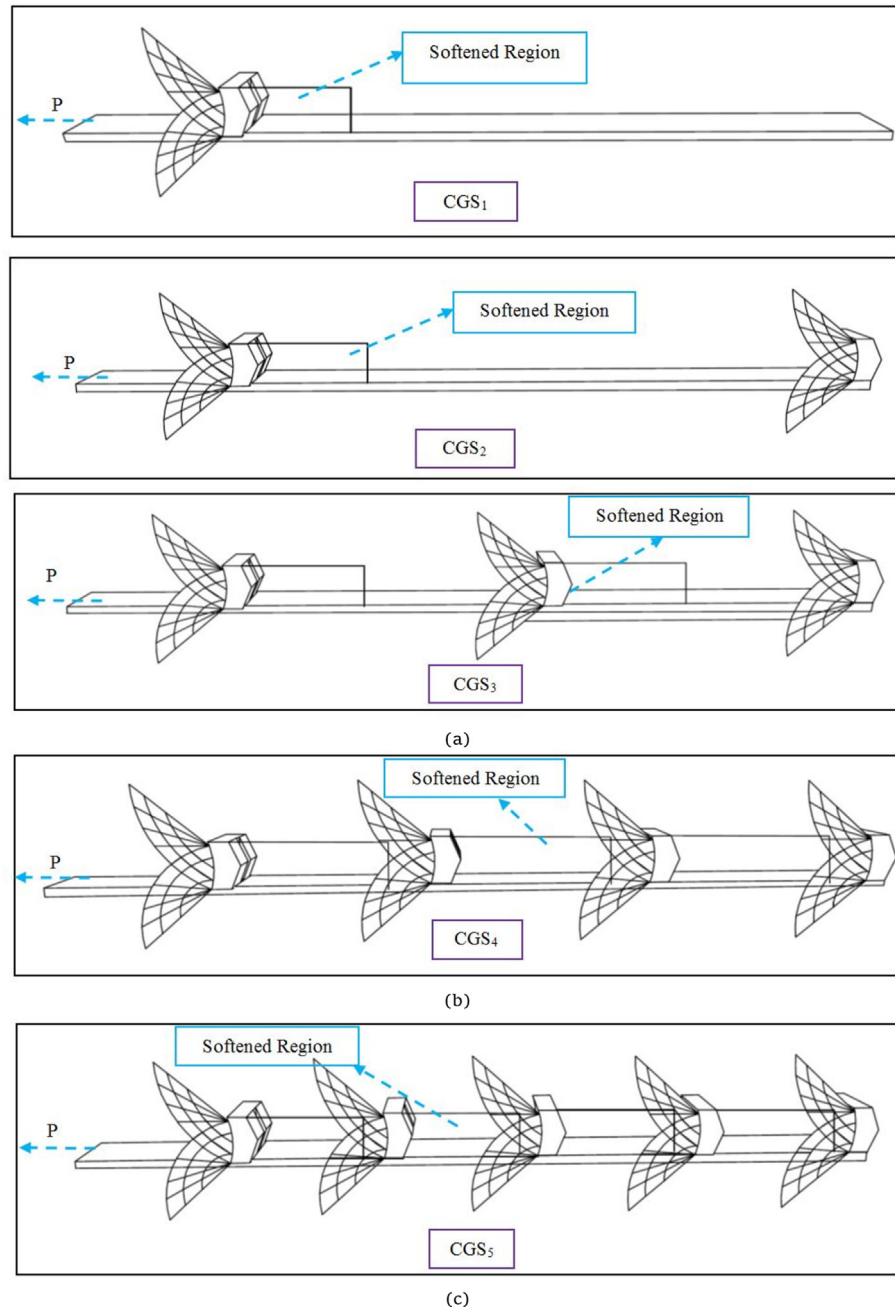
Different bearing failure mechanisms: (a) Individual failure, (b) interference failure, and (c) block failure.
